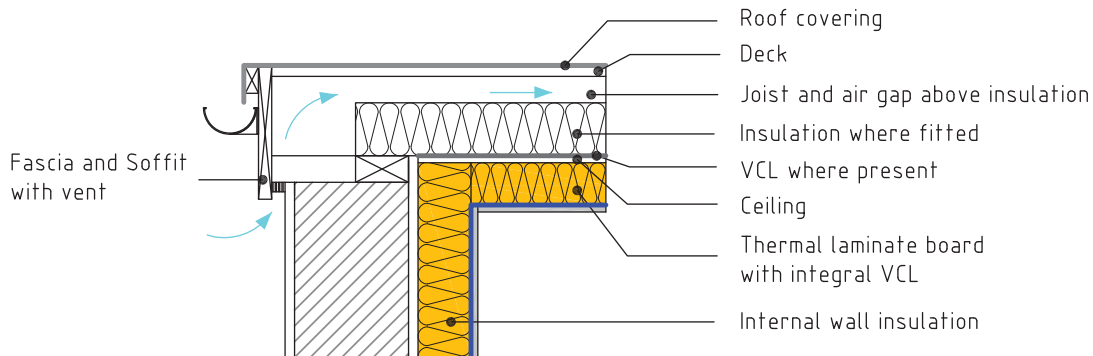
Cold roof upgrade with thermal laminate board, carried out internally
